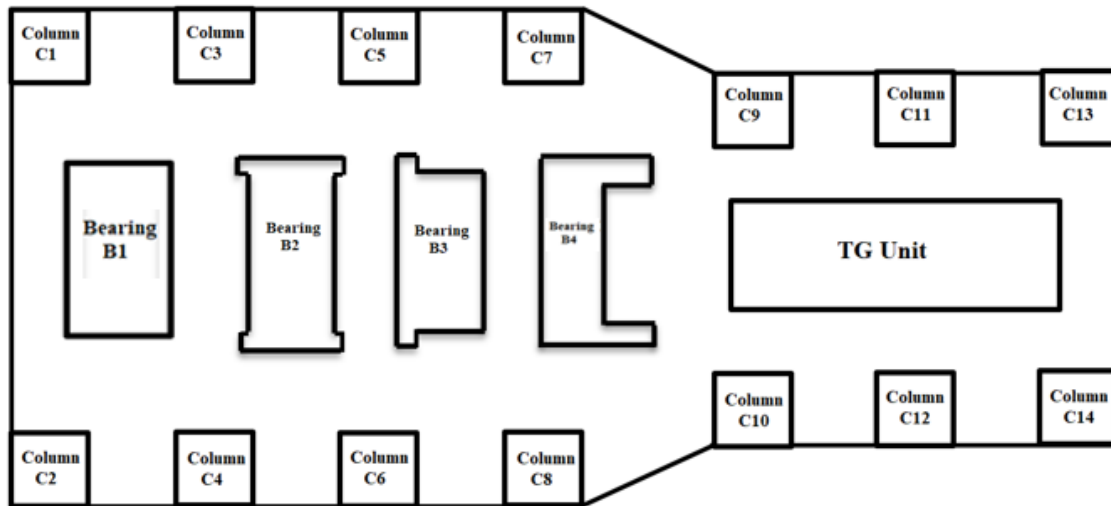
Typical Sketch of TG unit with concrete bearing pedestals and supporting column
